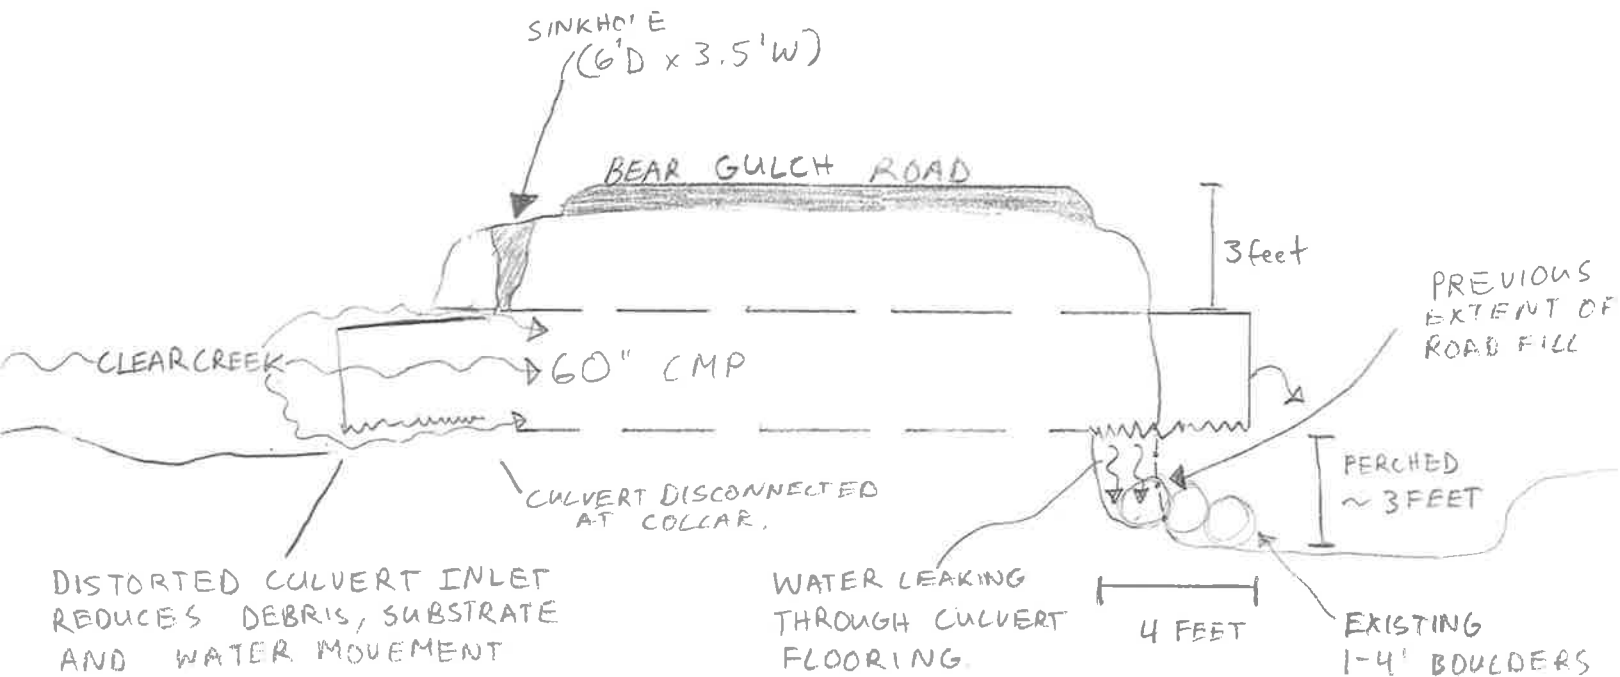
BEAR GULCH PROJECT SITE - CULVERT REPLACEMENT
